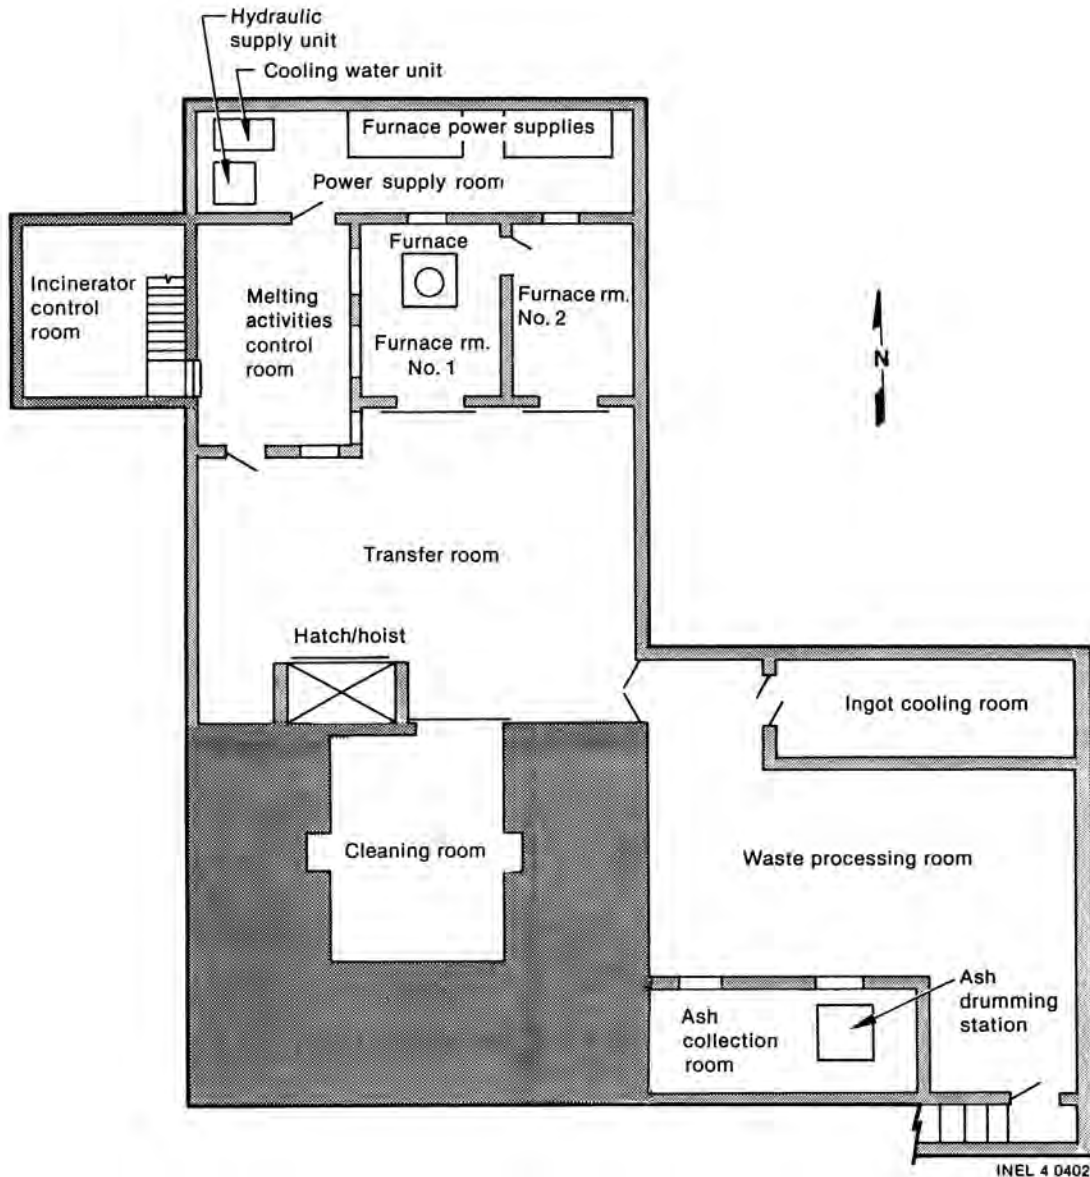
Waste Experimental Reduction Facility--basement floor plan.
